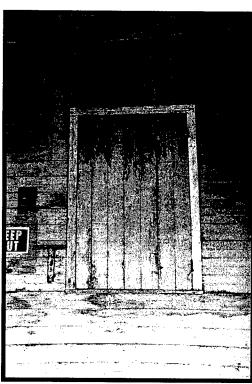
A detail of the board and batten shutter at one of the windows adjacent to the front door at Standing Structure 55-1013.
